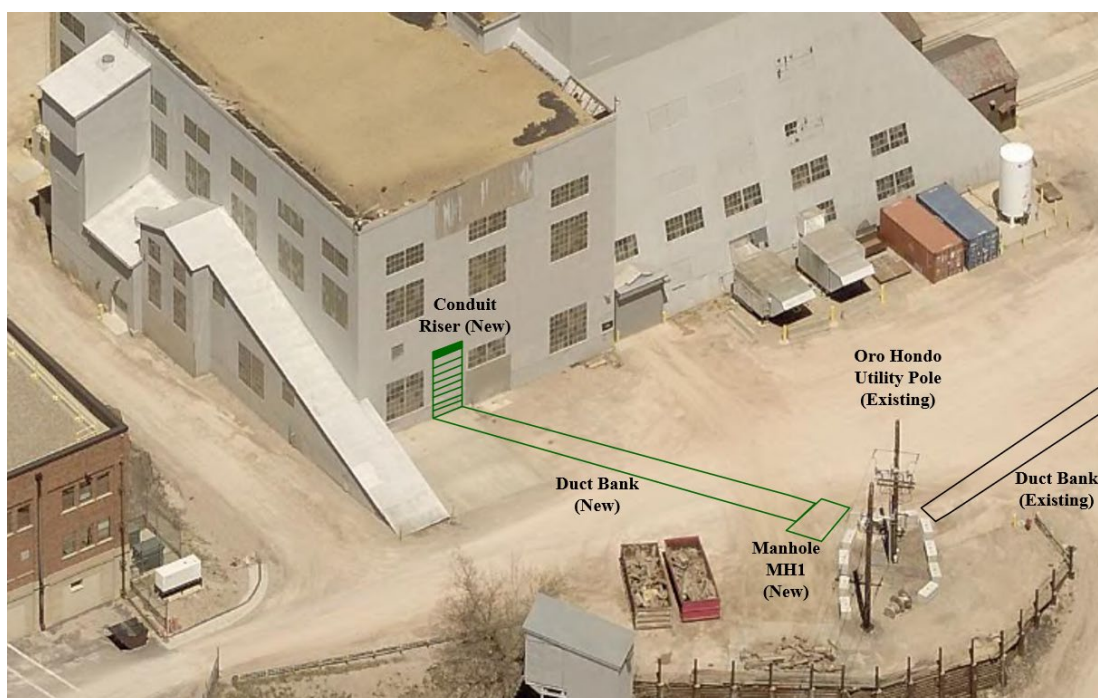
Yates Crusher Building Duct Bank and Conduit Riser
